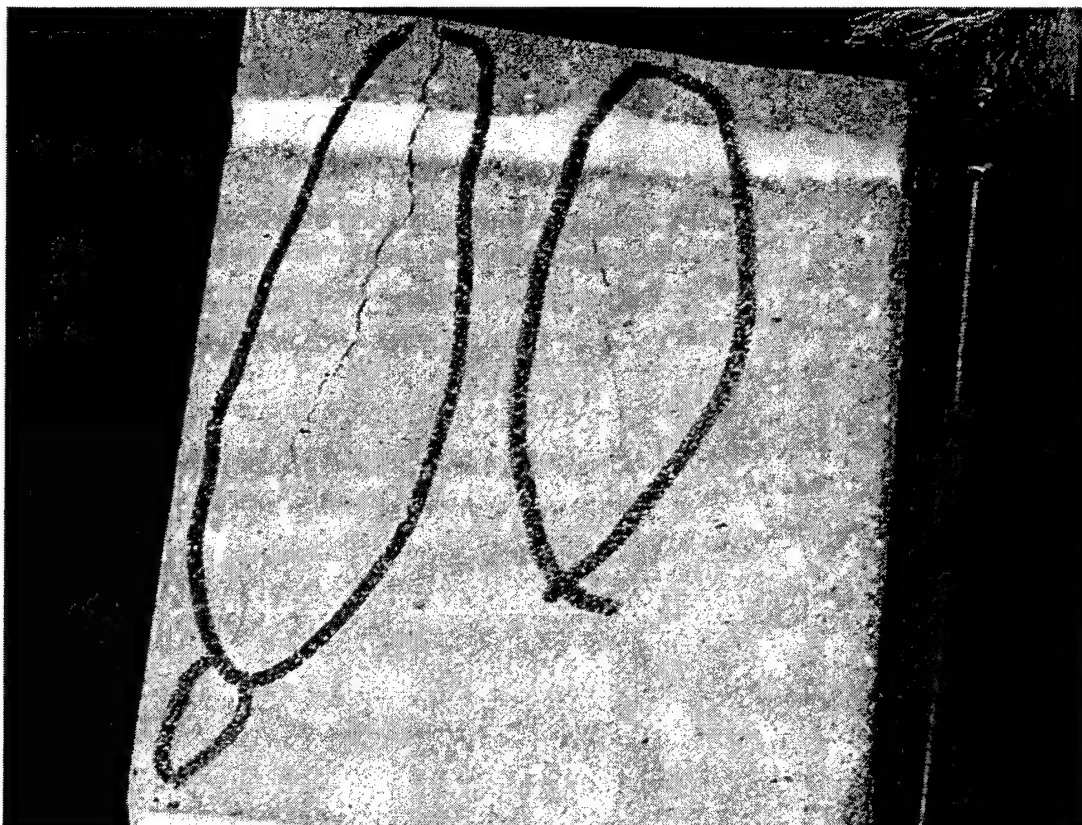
A side view of the top of Wall 2 showing the cracks that appeared at 30,000 lb load.
